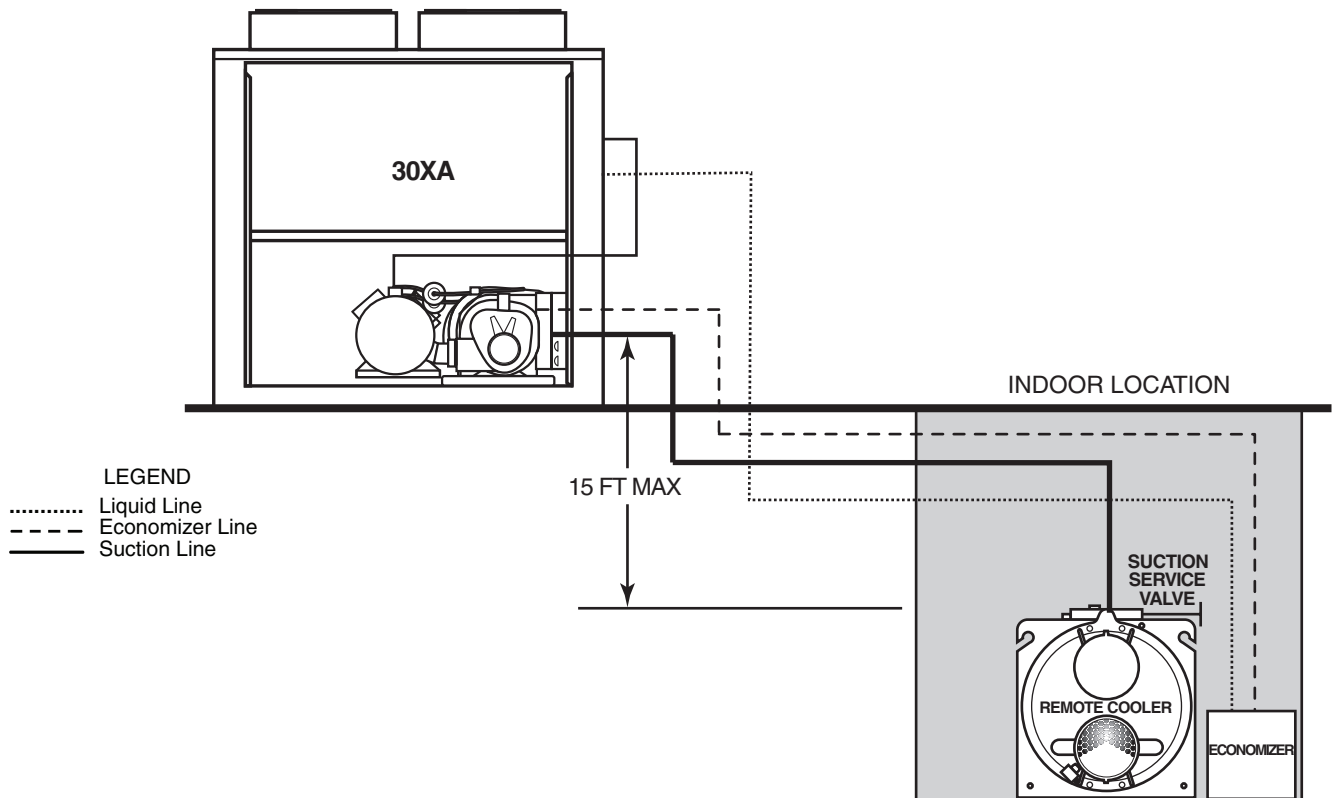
30XA Unit with Cooler Located Below Unit (Single Circuit Shown)
